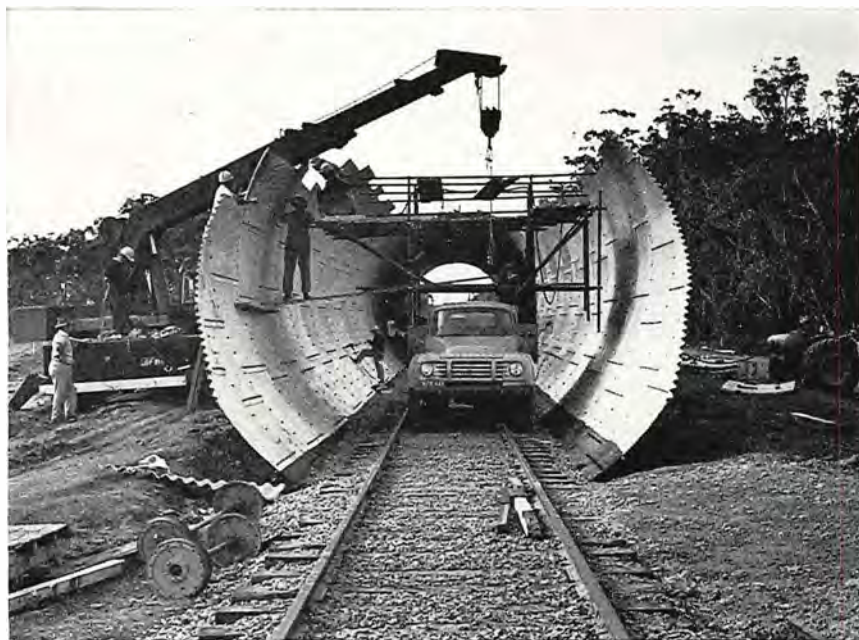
Lyons grade separation structure: placing and bolting of multiplate ring, using a crane and motor truck mounted scaffolds.
